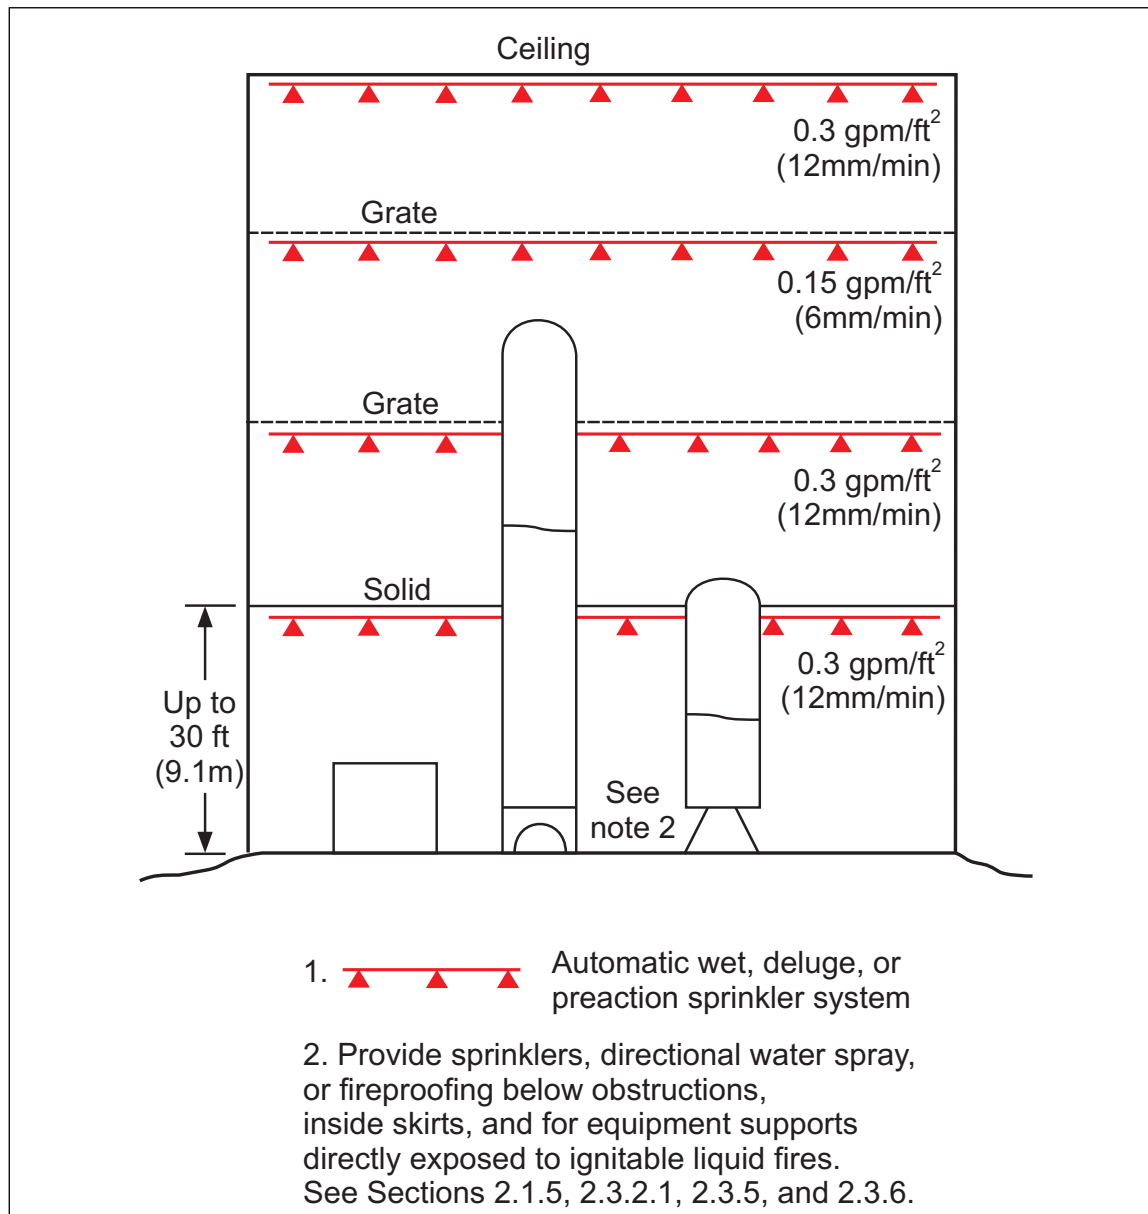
Indoor processing structures: example of fire protection with grated and solid floors
